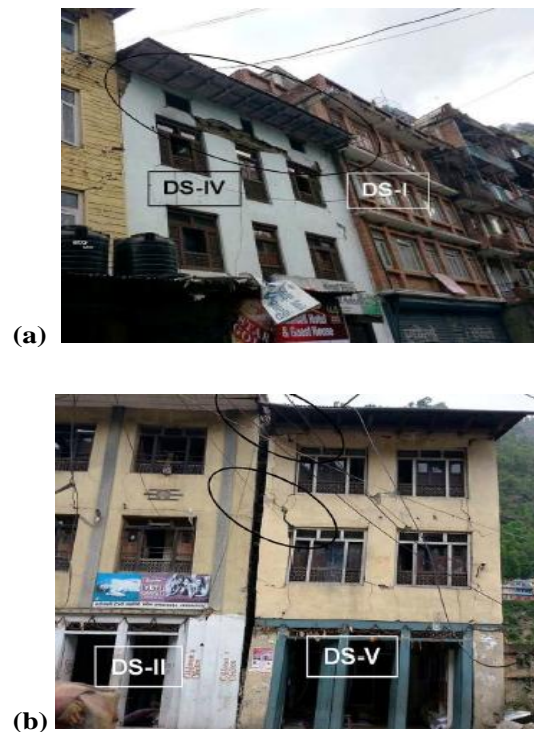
Masonry building failures; (a) Horizontal cracks between openings, (b) Vertical cracks between openings [17]
